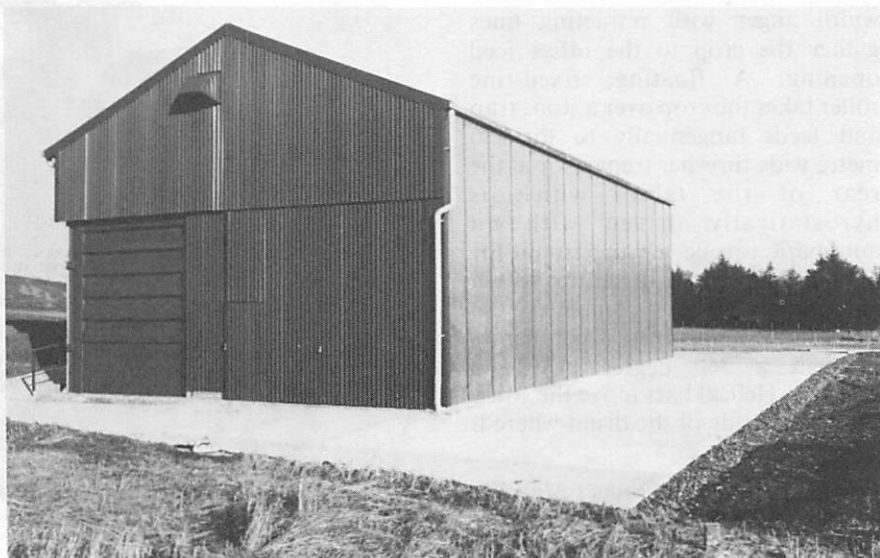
Solar barn showing south facing wall with Filon covered suspended plate collector
